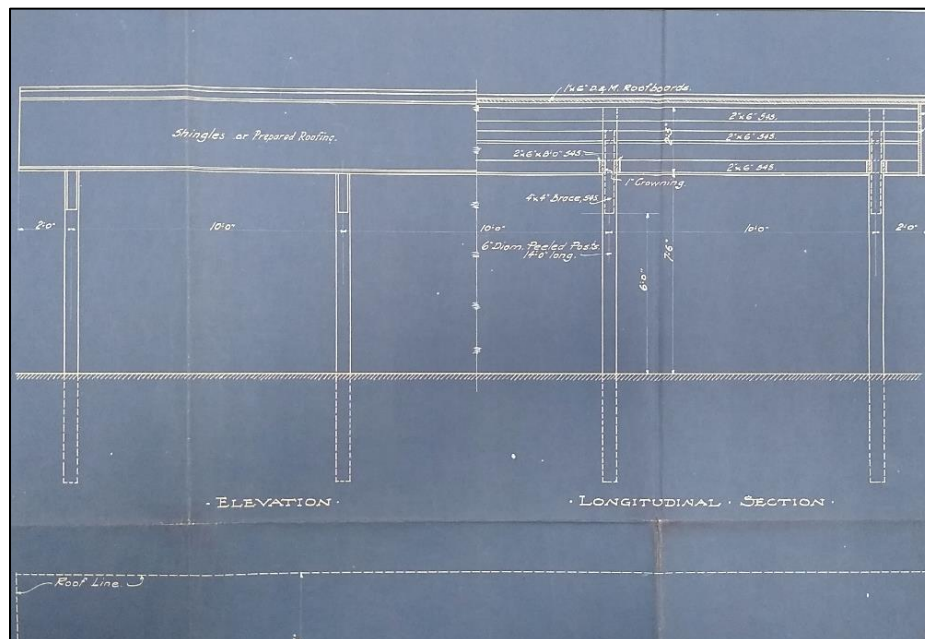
Side elevation plan of the typical passenger shelter sheds erected at Camp McCoy, 1911. (Image reproduced with permission from Milwaukee Road Archives.)⁴³⁷
